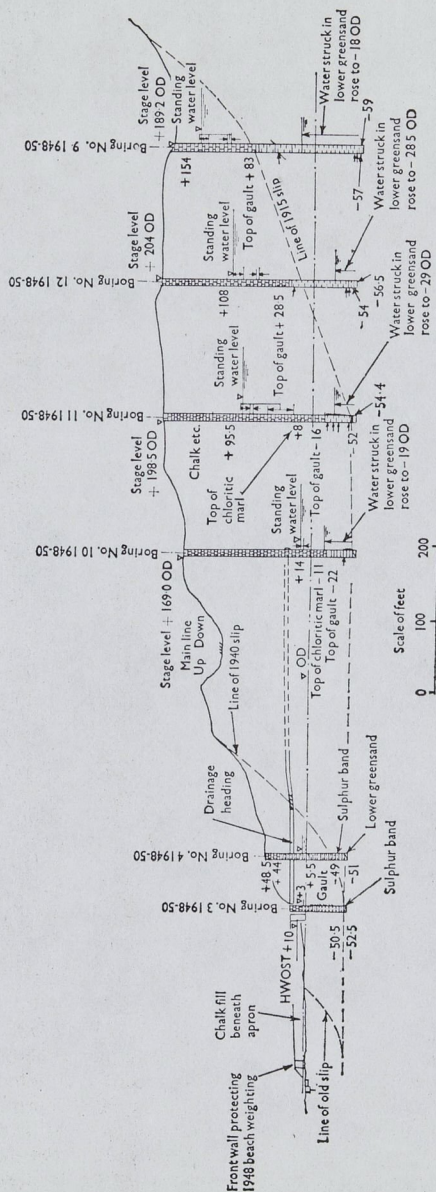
Typical cross section at Folkestone Warren indicating surfaces of sliding and remedial work
